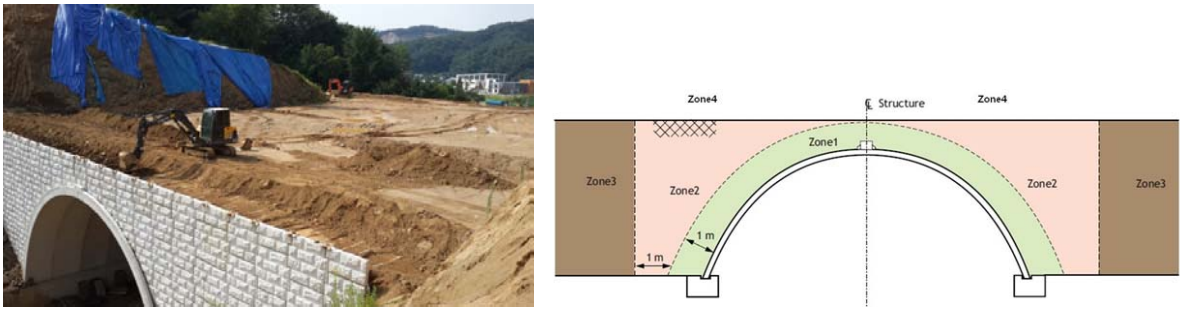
Backfill compaction zones surrounding the precast concrete arch structure
